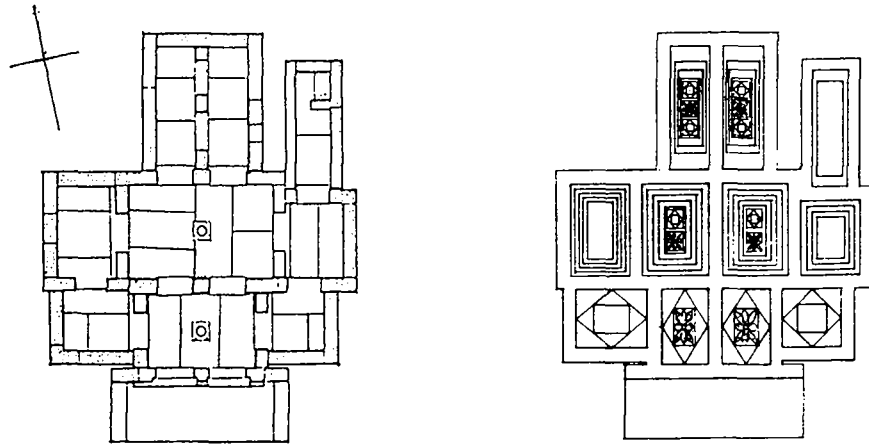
Ground and ceiling plan the tomb at Yinan 沂南기남 (2nd C. AD) (scale: 1 : 100)
